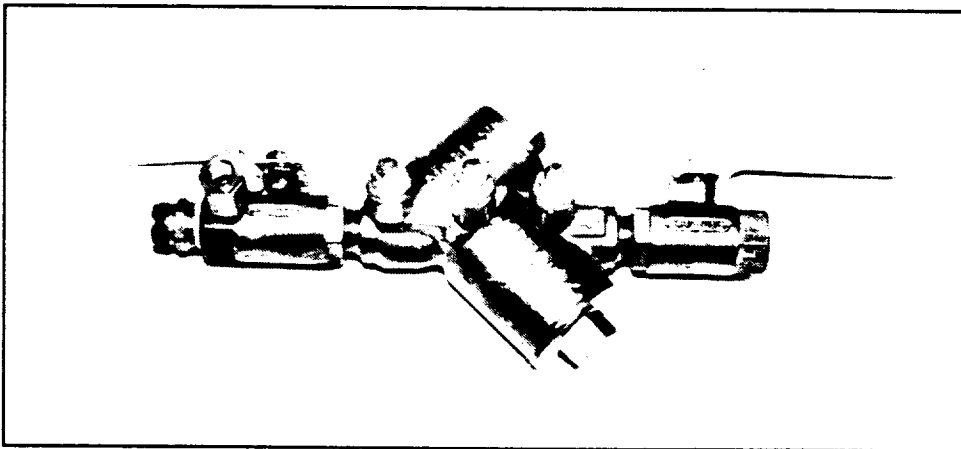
Typical Small Size Spring-Loaded Double Check Valve Assembly.
